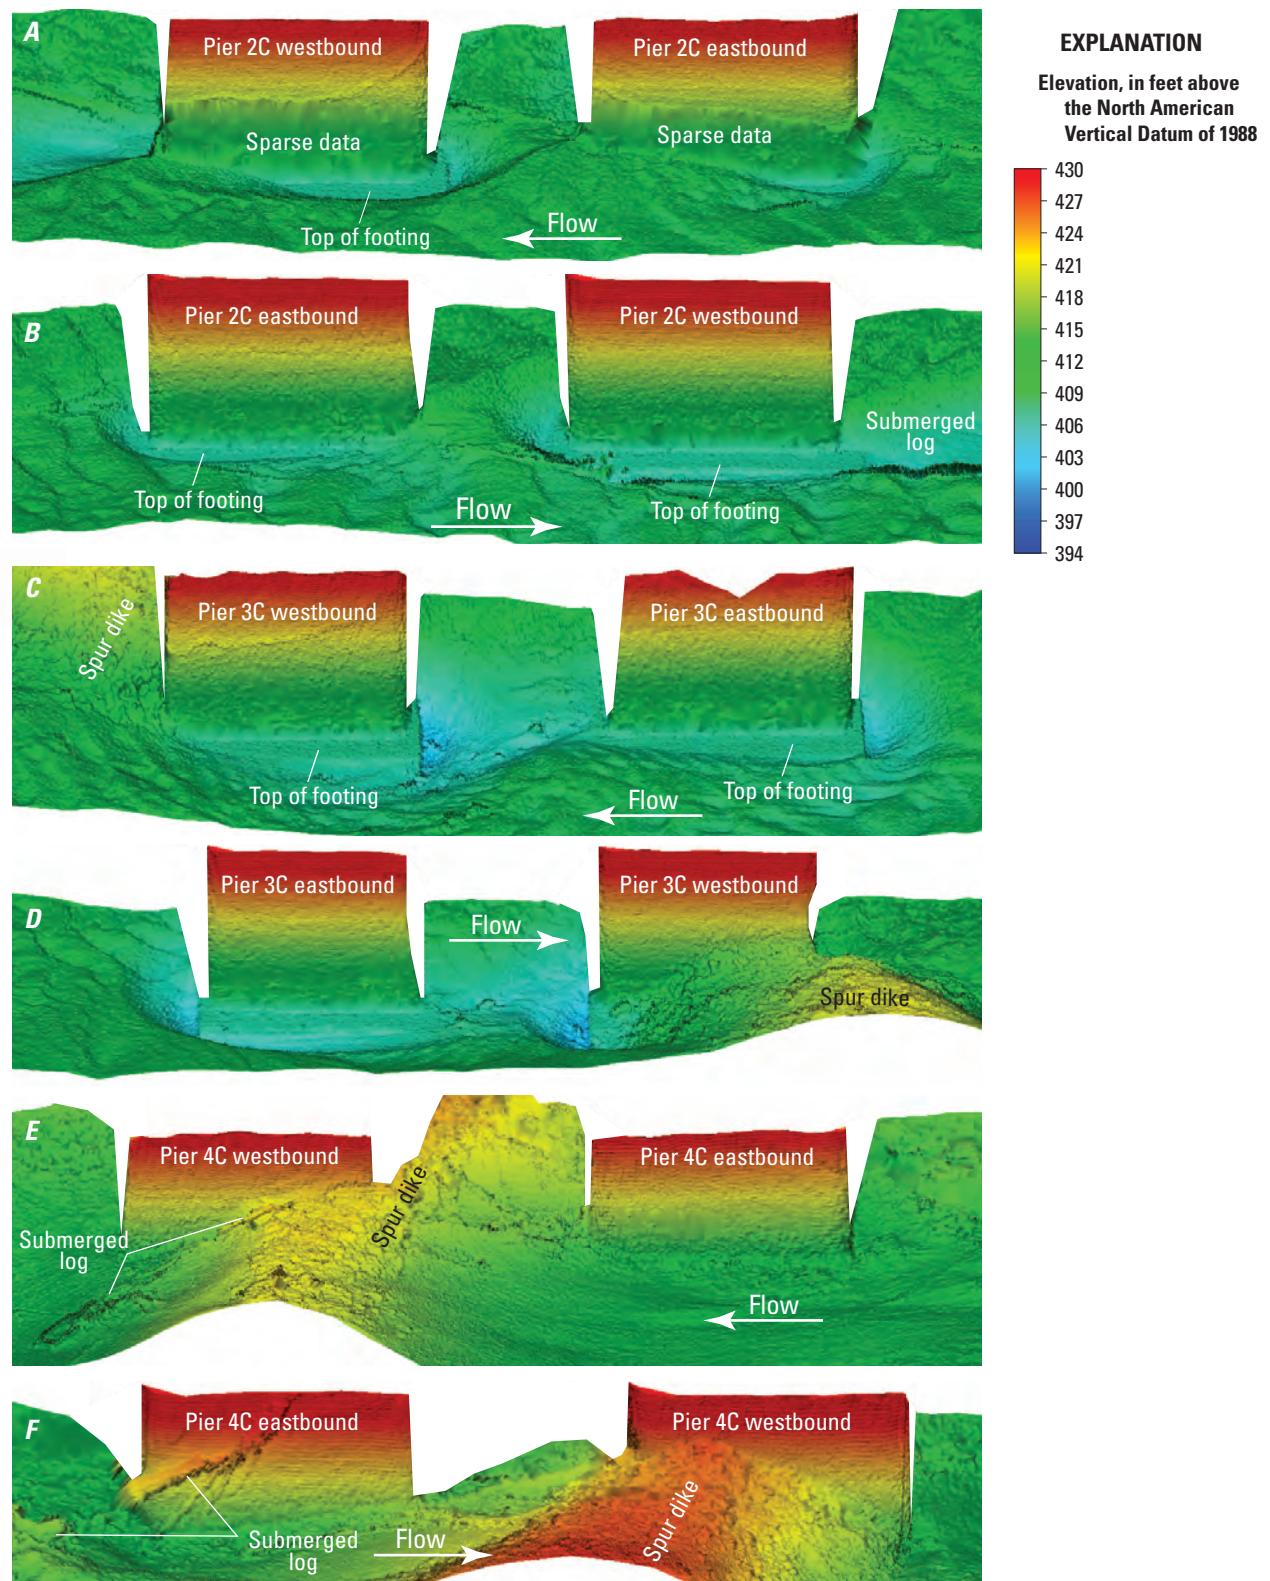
Shaded triangulated irregular network visualization of the channel bed and piers of dual bridge structure A4557 on State Highway 370 over the Missouri River near St. Louis, Missouri. *A*, left (northwest) side of pier 2C. *B*, right (southeast) side of pier 2C. *C*, left (northwest) side of pier 3C. *D*, right (southeast) side of pier 3C. *E*, left (northwest) side of pier 4C. *F*, right (southeast) side of pier 4C.
